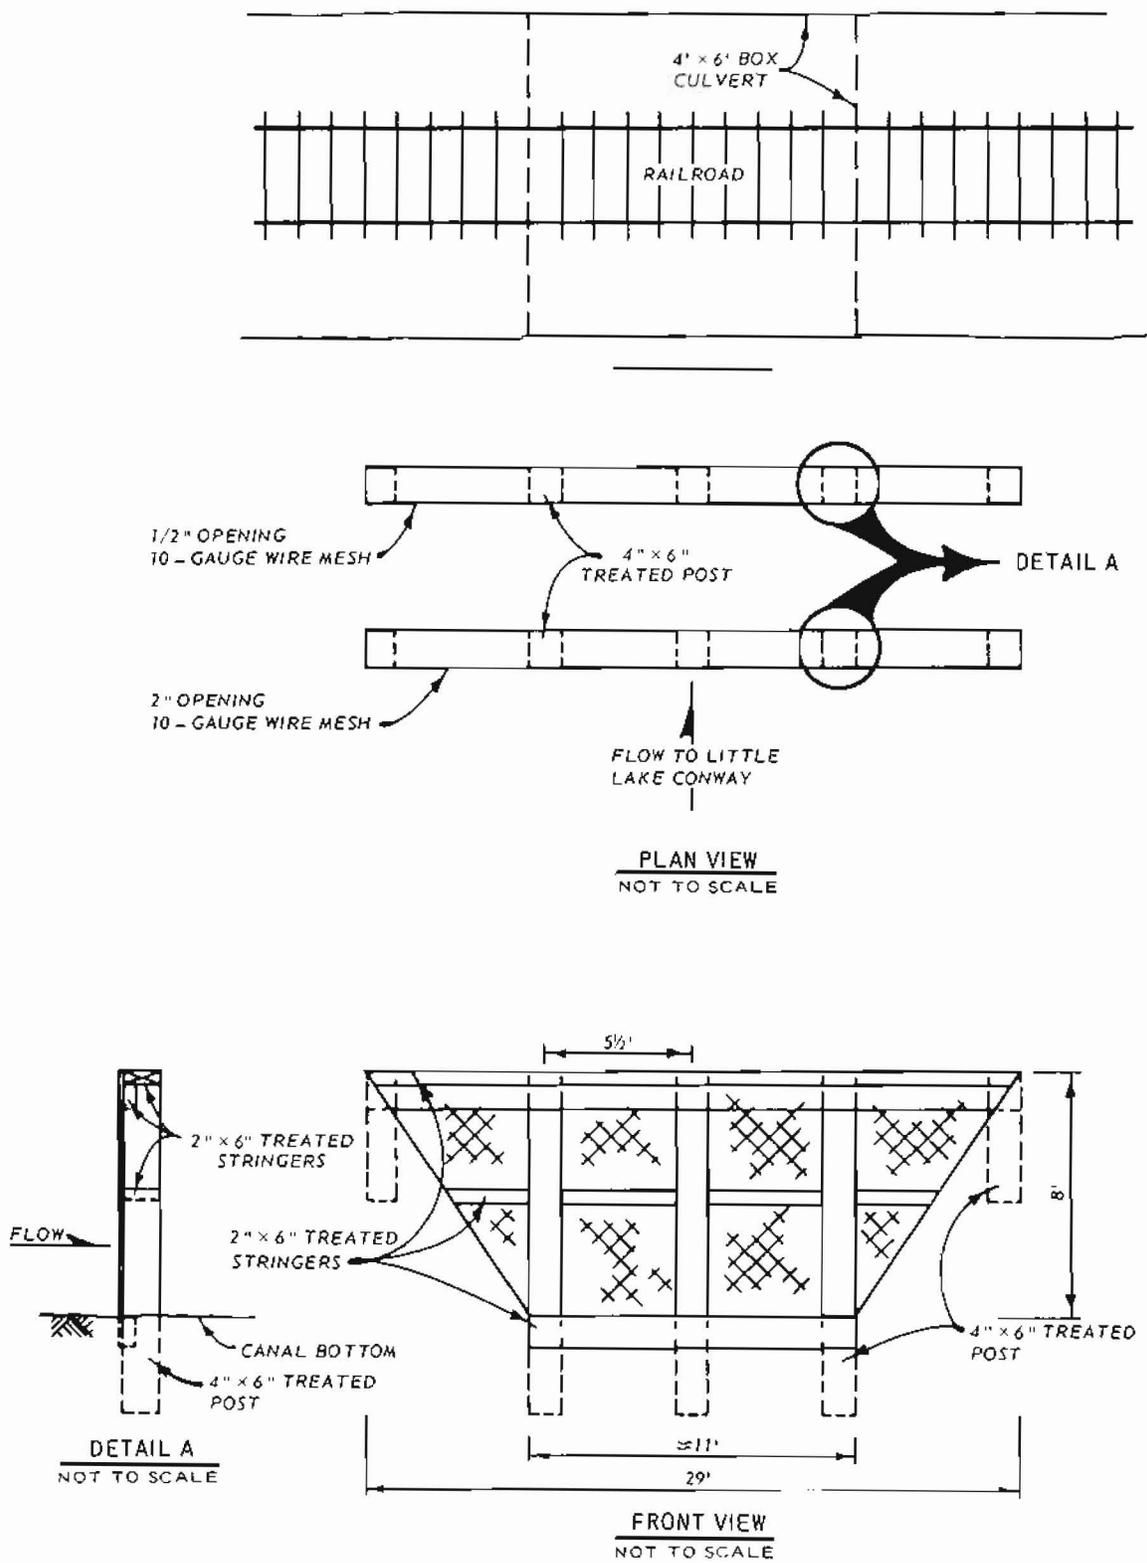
Barrier system—inlet canal from Lake Jessamine, location 2
